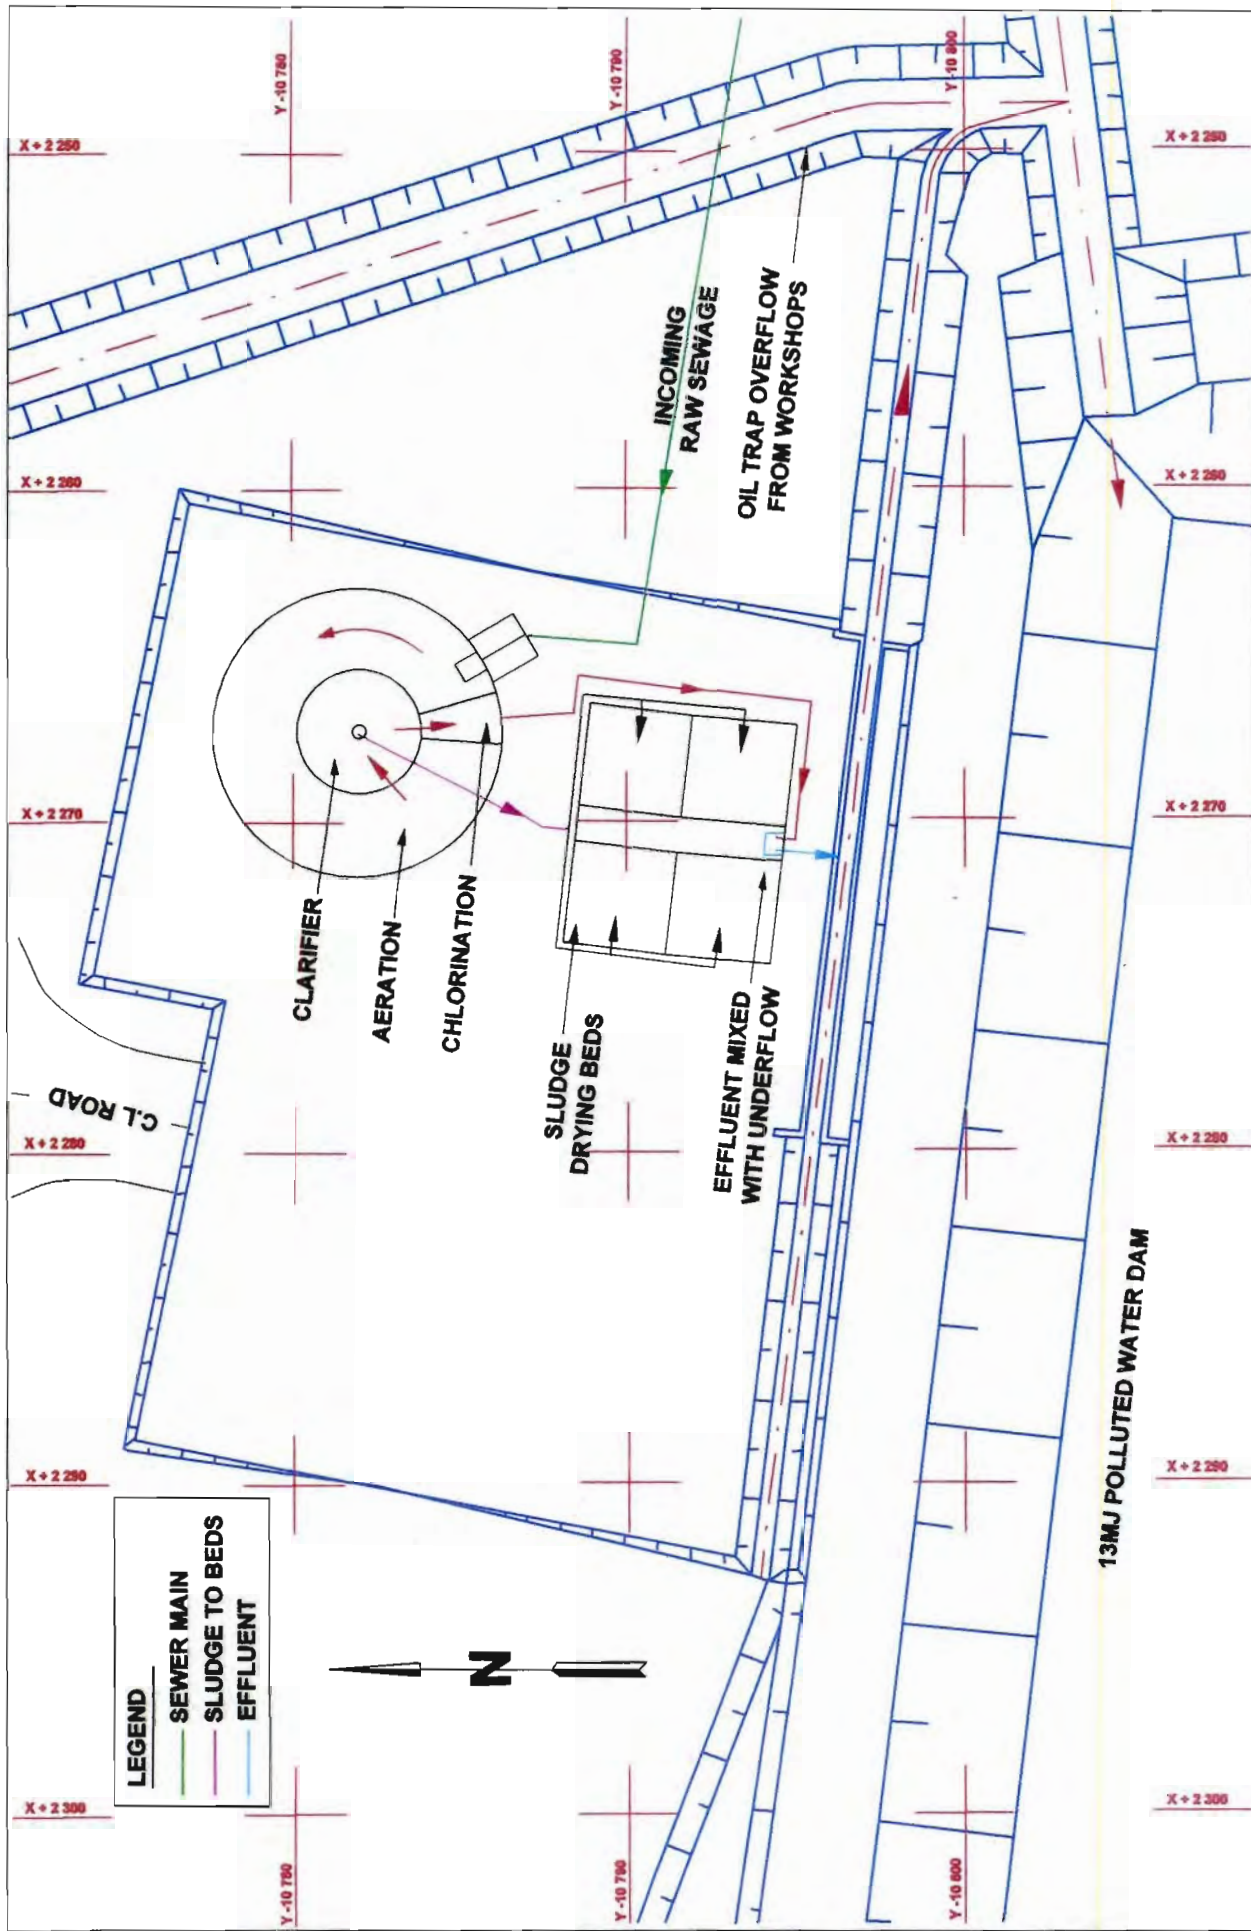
LAYOUT OF SEWAGE TREATMENT PLANT
